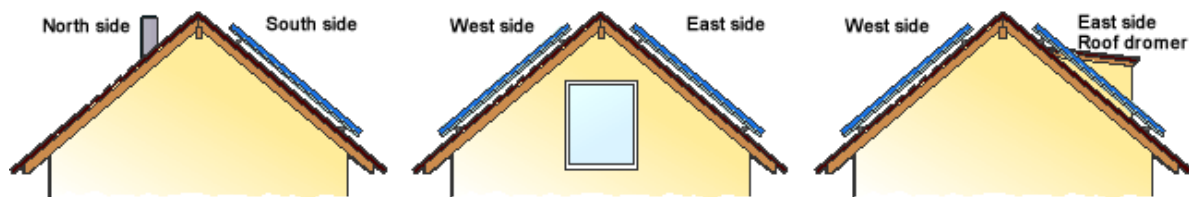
Different types of access for firefighters to a pitched roof [source: DGS Berlin]
